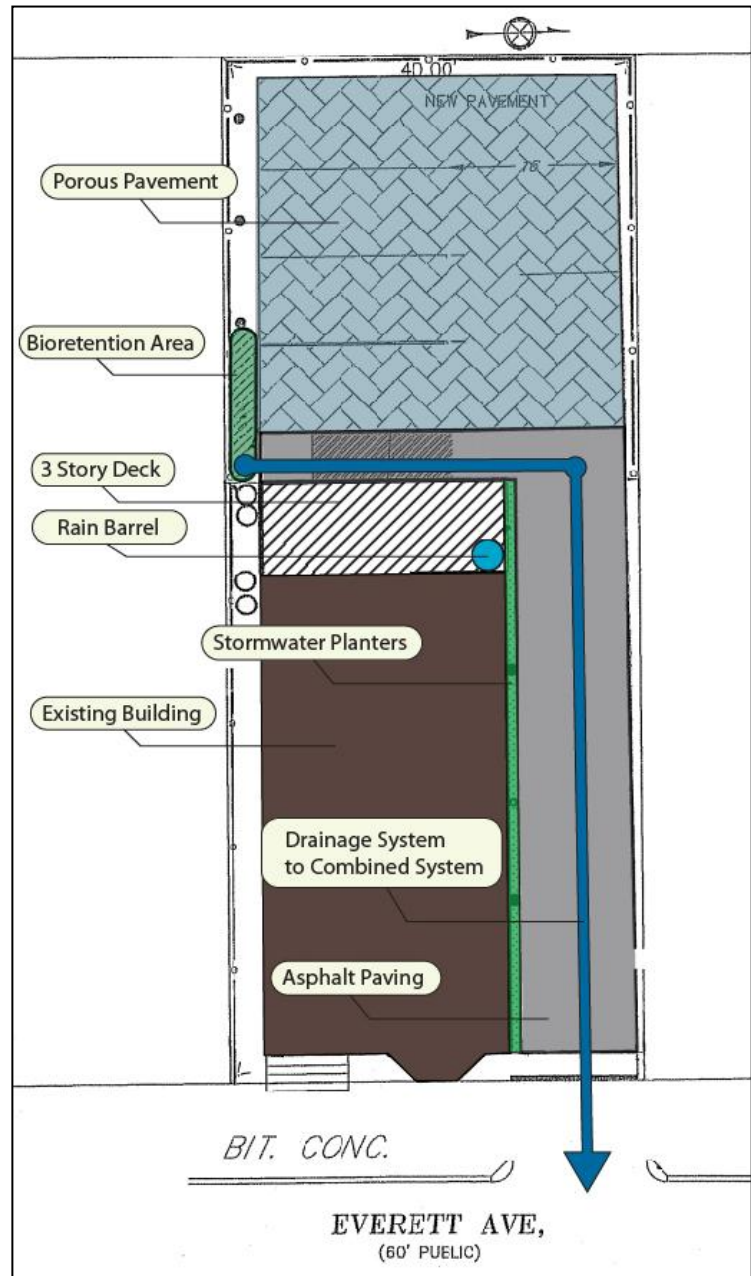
Alternative Plan for 242 Everett Avenue with Green Infrastructure Measures
